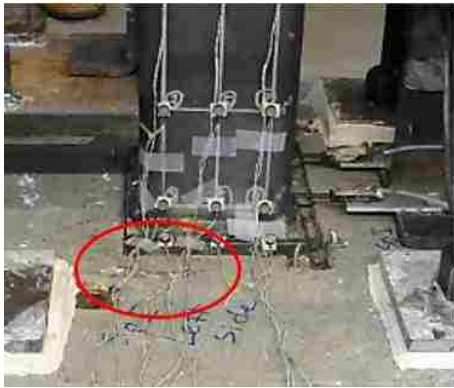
Specimen 2-2-0.92 before testing (West side)
